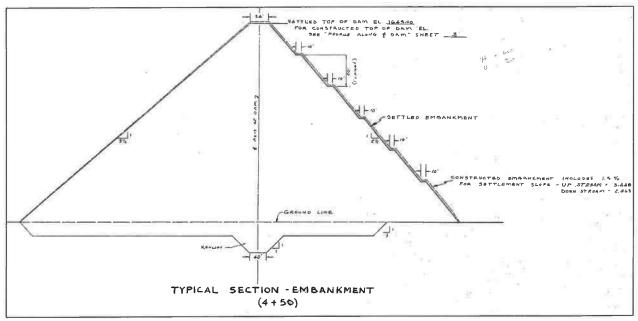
Lake Petit Dam Typical Section Showing Design Surficial Geometry (Baldwin & Cranston, 1971)
